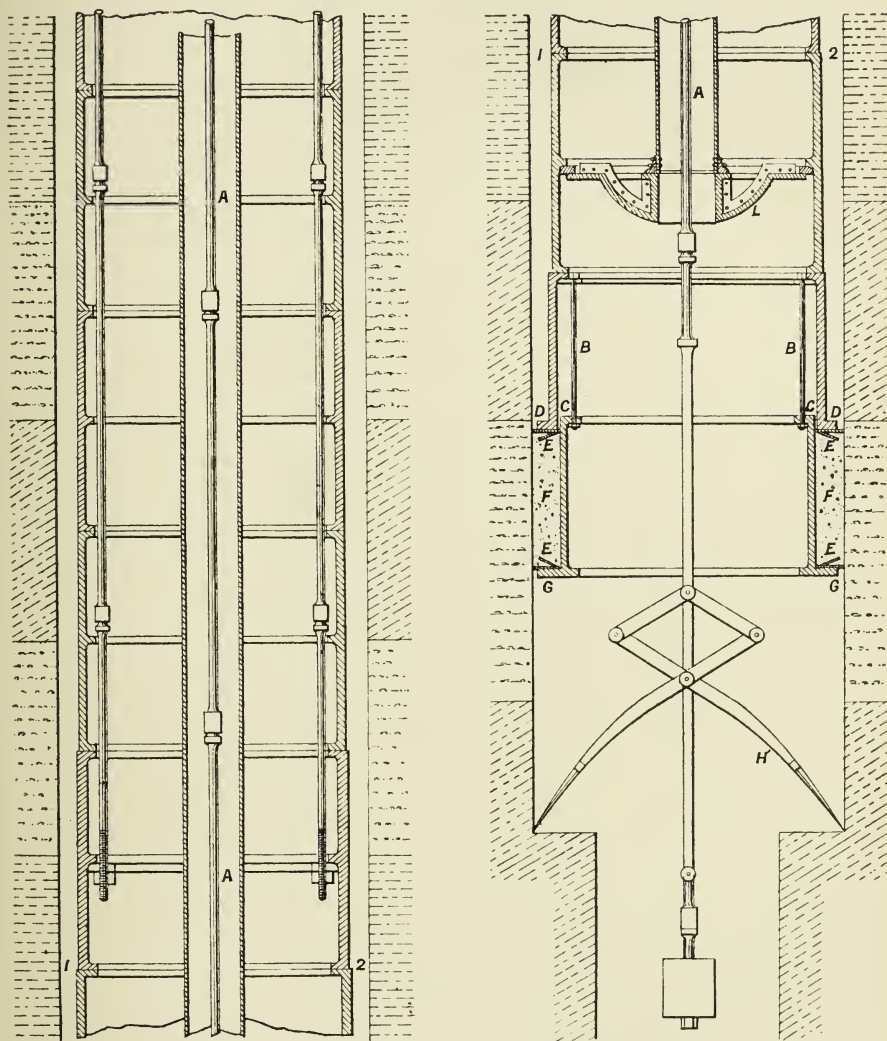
KIND-CHAUDRON SYSTEM OF SHAFT SINKING.
